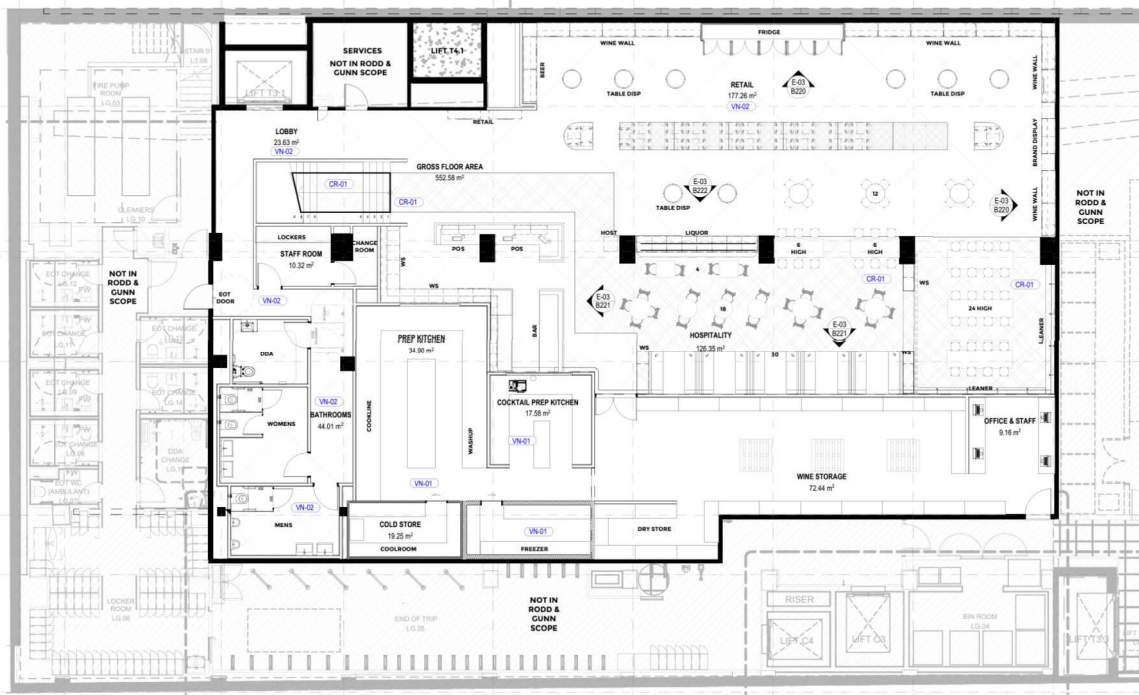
Proposed basement layout in the project area. Source: Extract of drawing B111, Studio Y.
